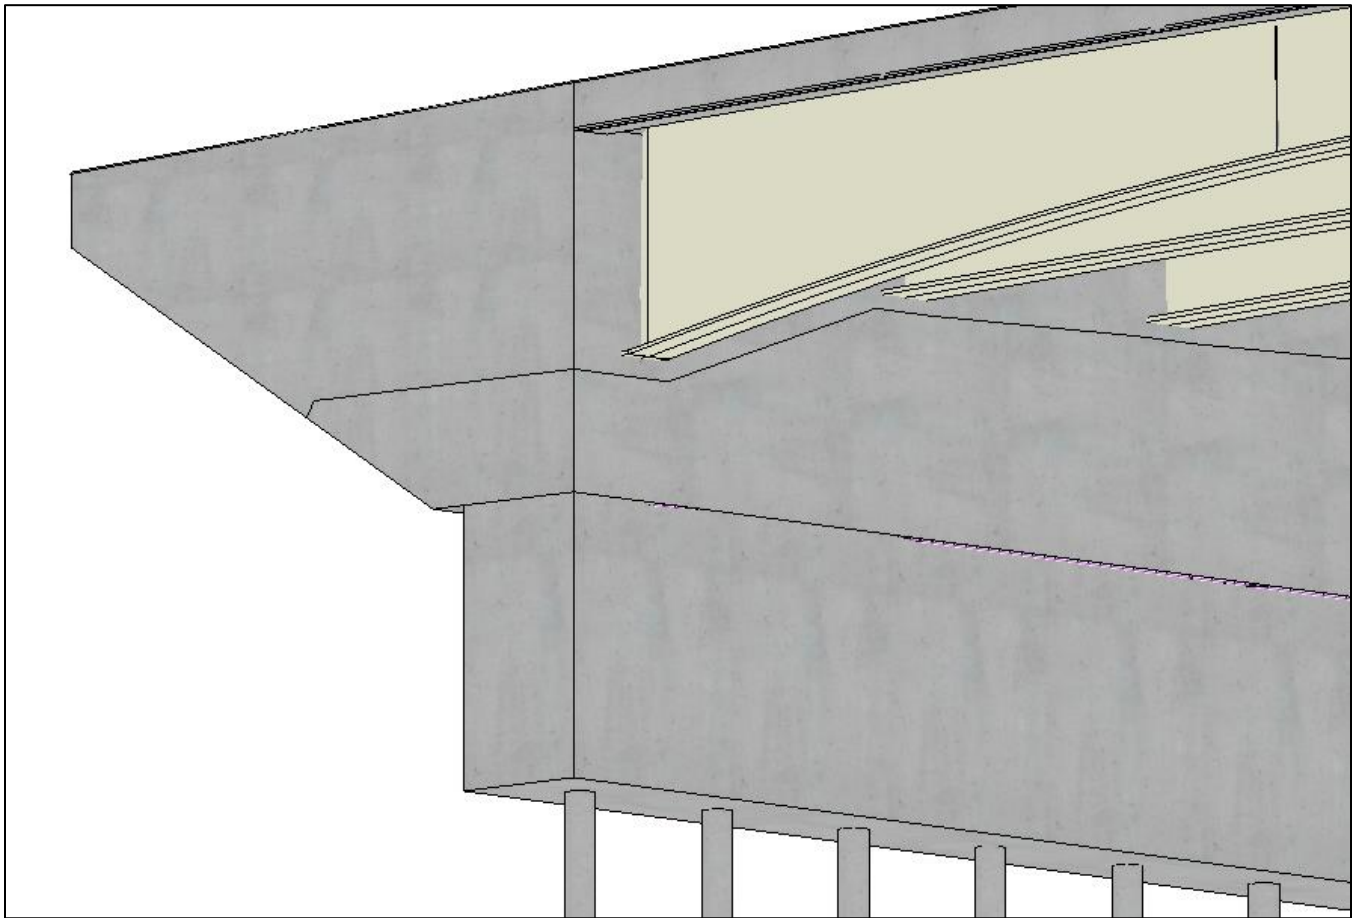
Example of Completed Construction Joint of Integral Abutment (with Cap Extension)
